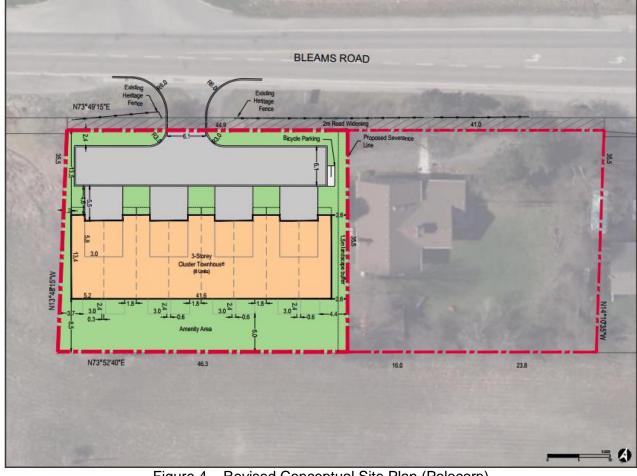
Revised Conceptual Site Plan (Polocorp)
